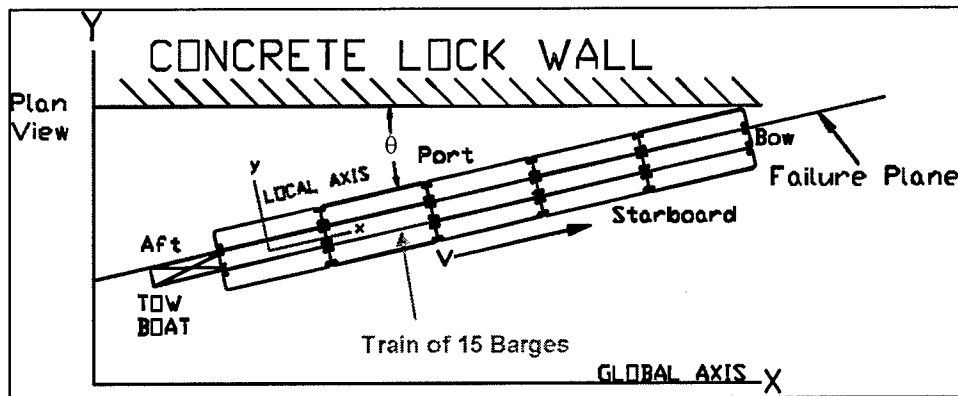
Longitudinal failure mechanism: Lashing yields along a longitudinal failure plane between barges
